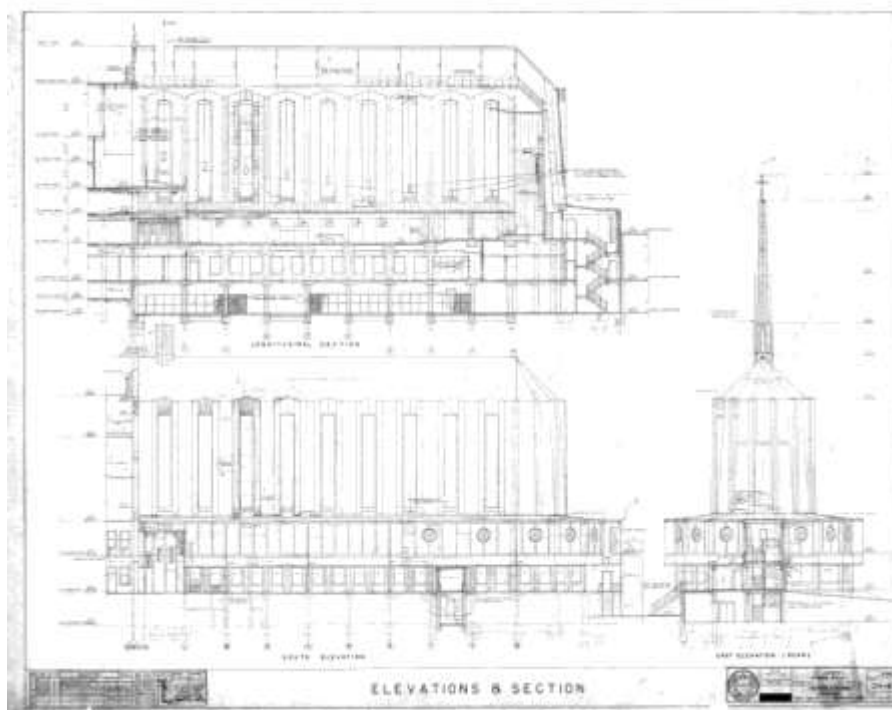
Elevations and sections for Motherhouse Chapel, Marani, Morris & Allan (Heritage Planning).
